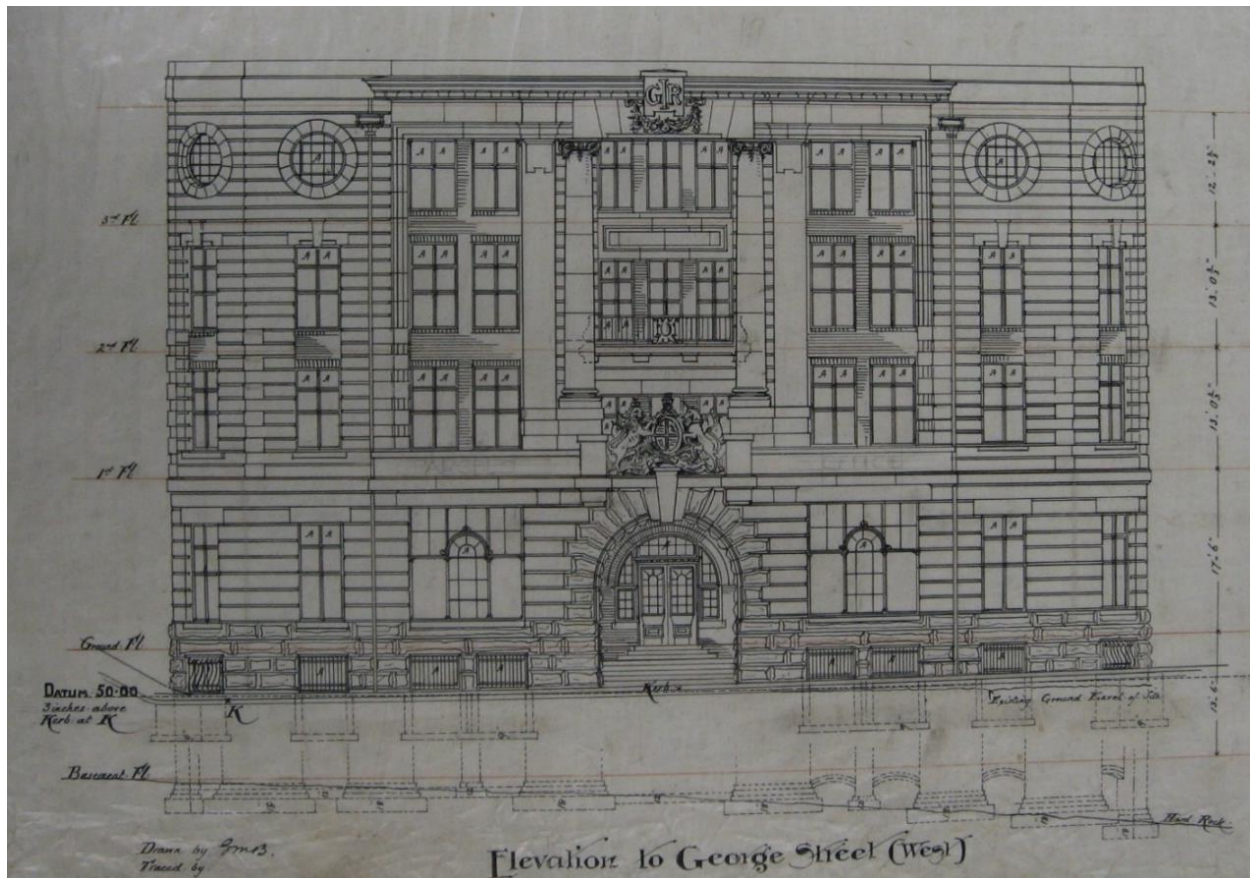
New Parcels Post Office Premises at the Central Railway Station: Elevation to George Street (west), 1910.
